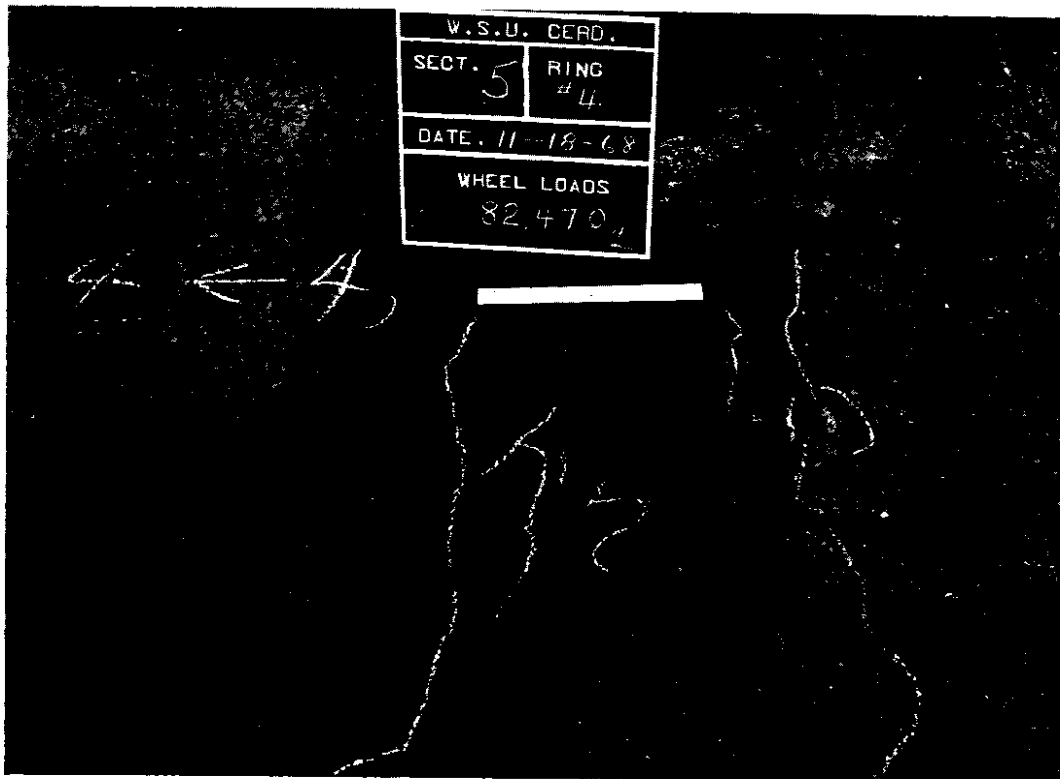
TRANSVERSE CRACKS AROUND CONSTRUCTION JOINT IN SECTION 5, 0.0 INCHES OF BASE AFTER 82,470 WHEEL LOADS-- NOVEMBER 18, 1968.
